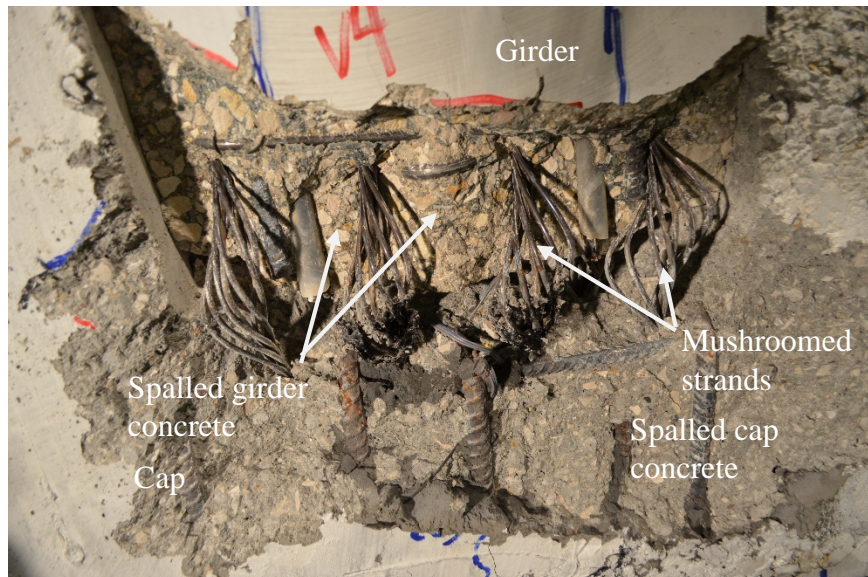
Spalling of concrete and mushrooming of strands
